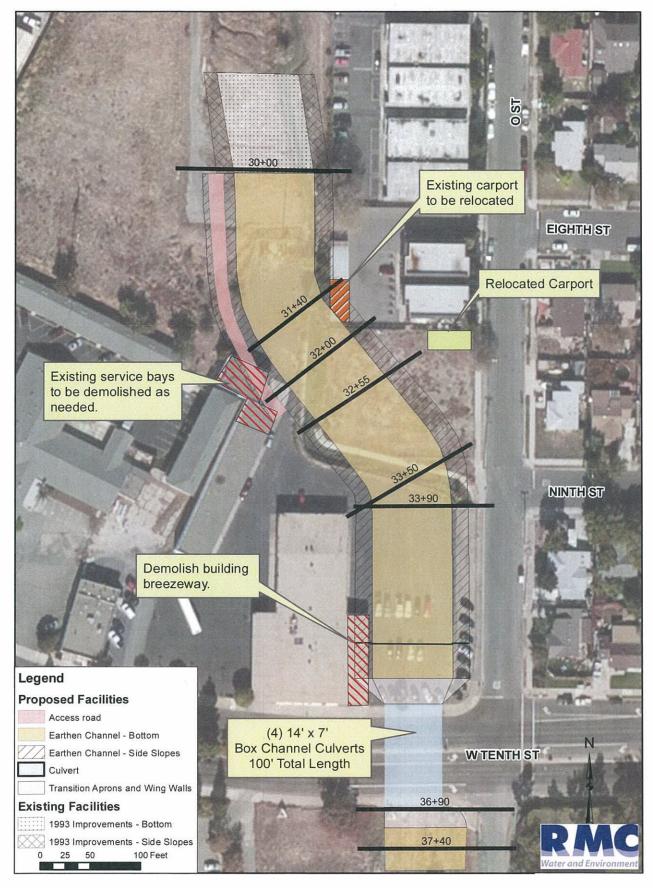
Alternative 3A: Revised Alternative Minimum Culvert Option
